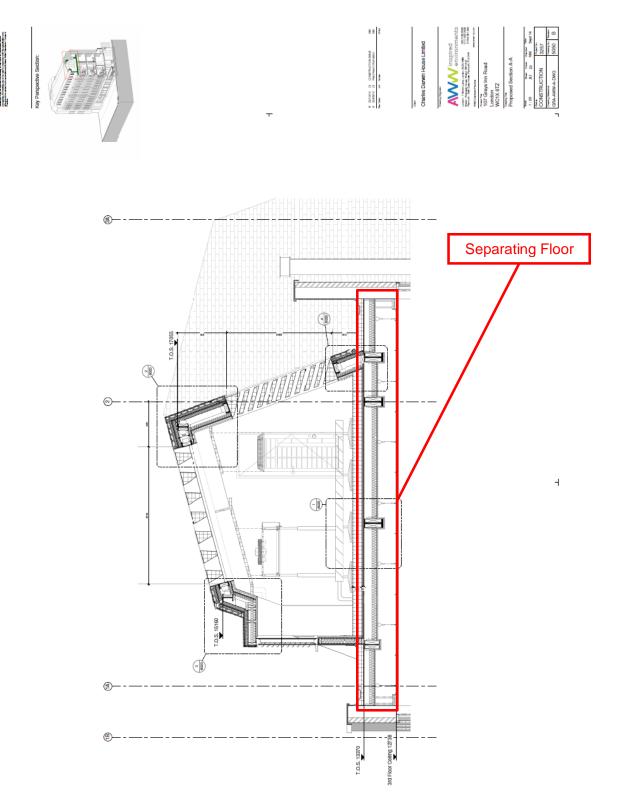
4TH FLOOR PLANT ROOM SECTION INDICATING SEPARATING FLOOR STRUCTURE (NTS)
